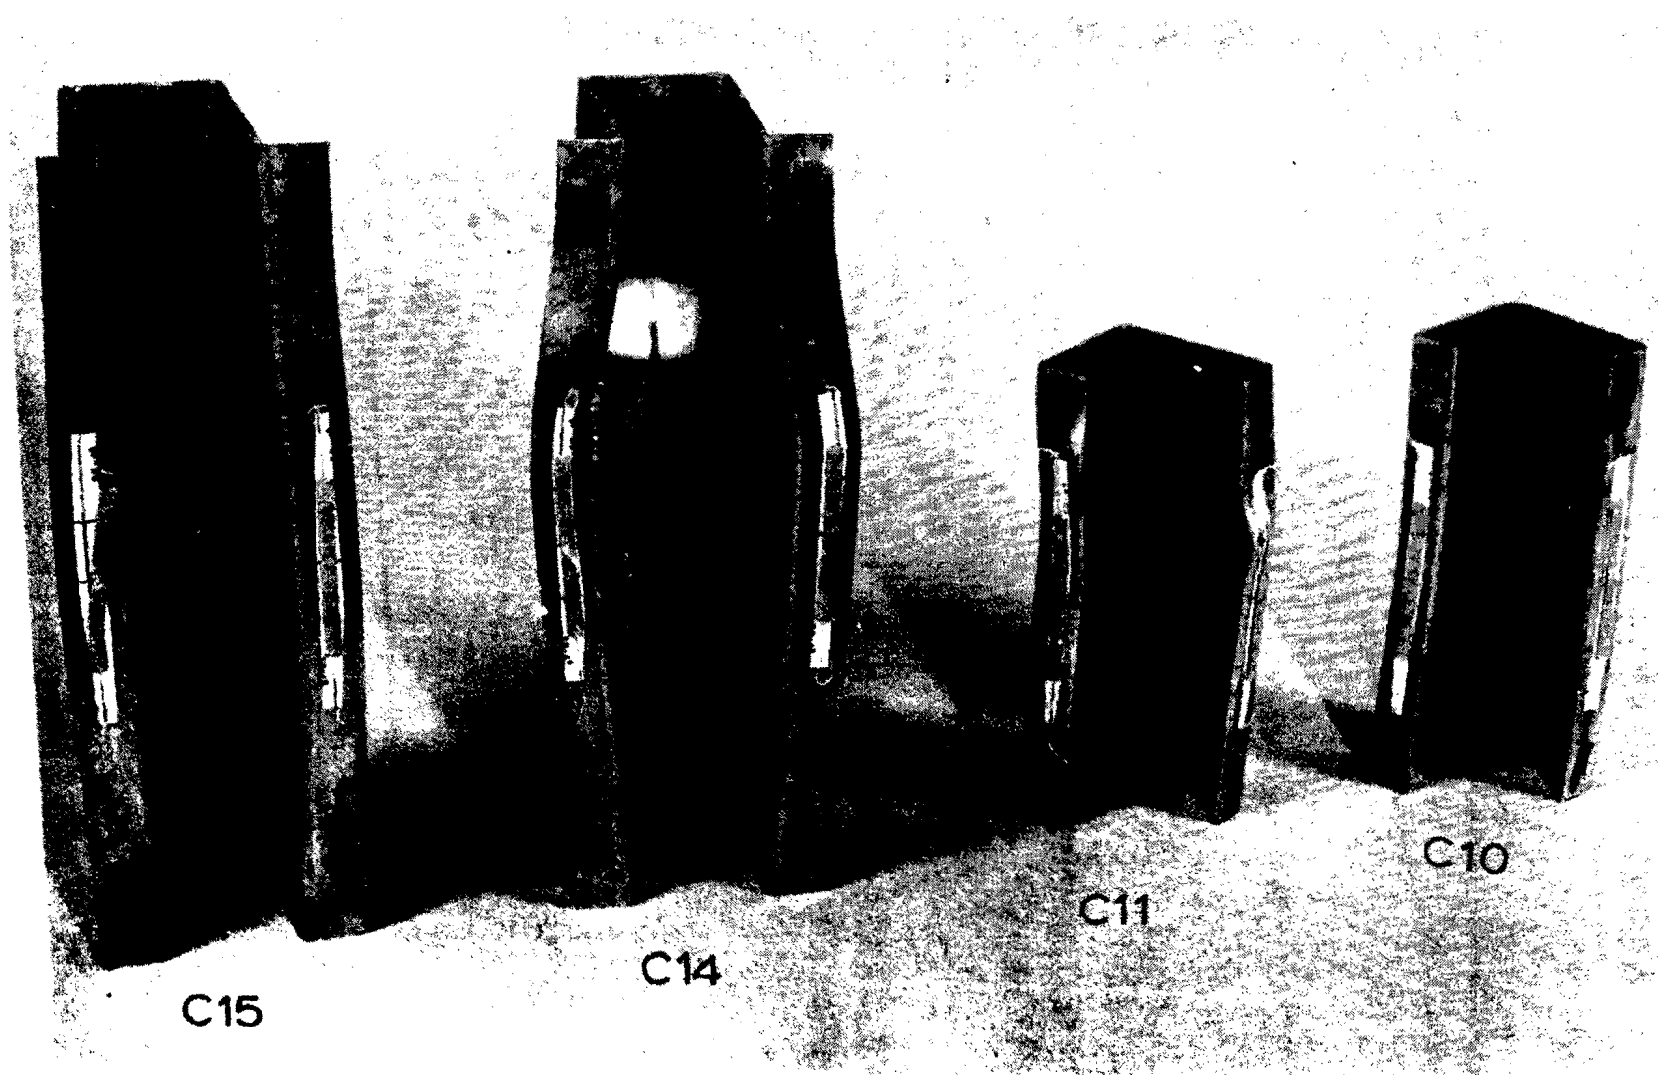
LOCAL BUCKLING OF LATERALLY UNSUPPORTED FULL SECTION COMPRESSION SPECIMENS
